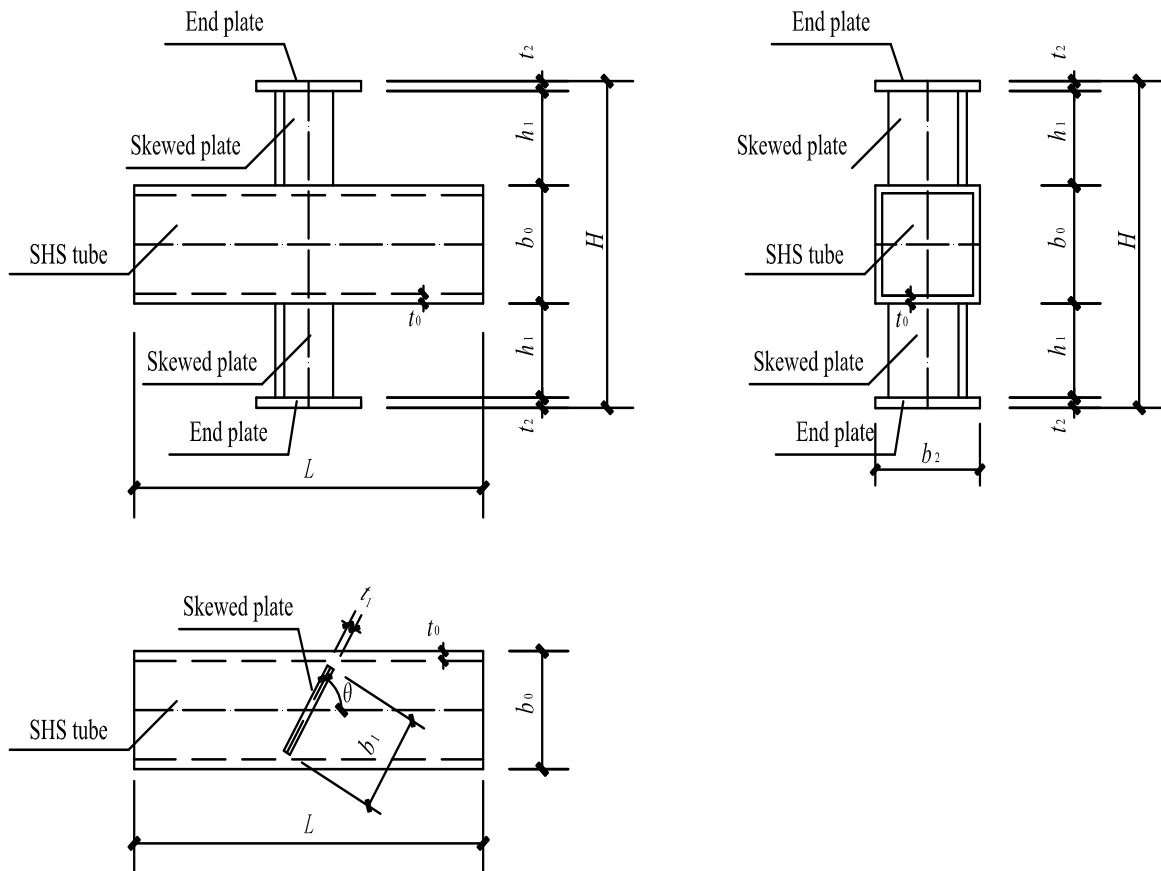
Detailed Schematic Drawings of Skewed Plate-to-SHS X-joints
